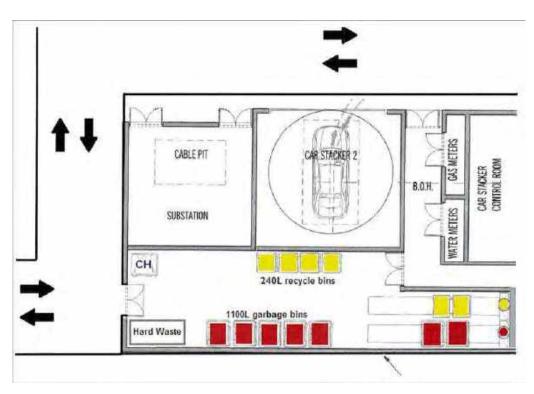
Example scaled waste management plan drawing of generic residential bin room.
